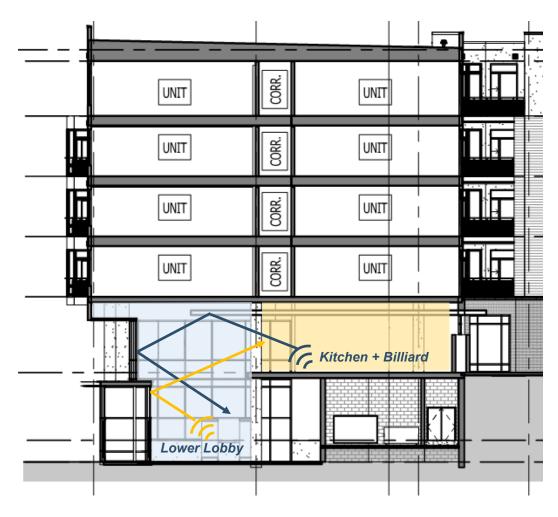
| Building Section - Acoustical Connections of Lower Lobby + E-Kitchen
